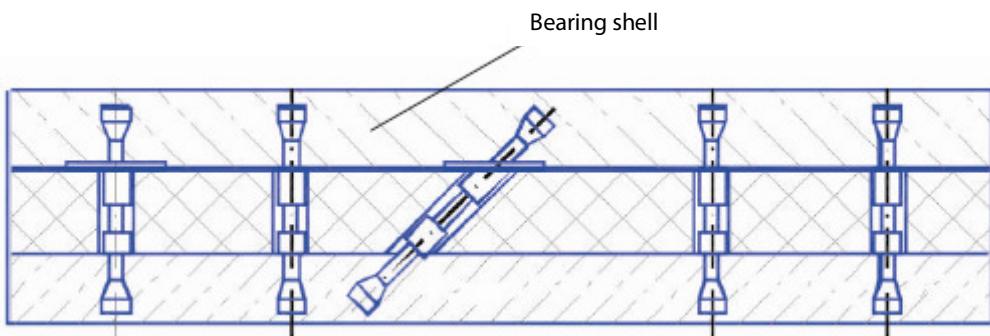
Laying out of reinforcement mat and concreting of bearing shell of a sandwich wall.
